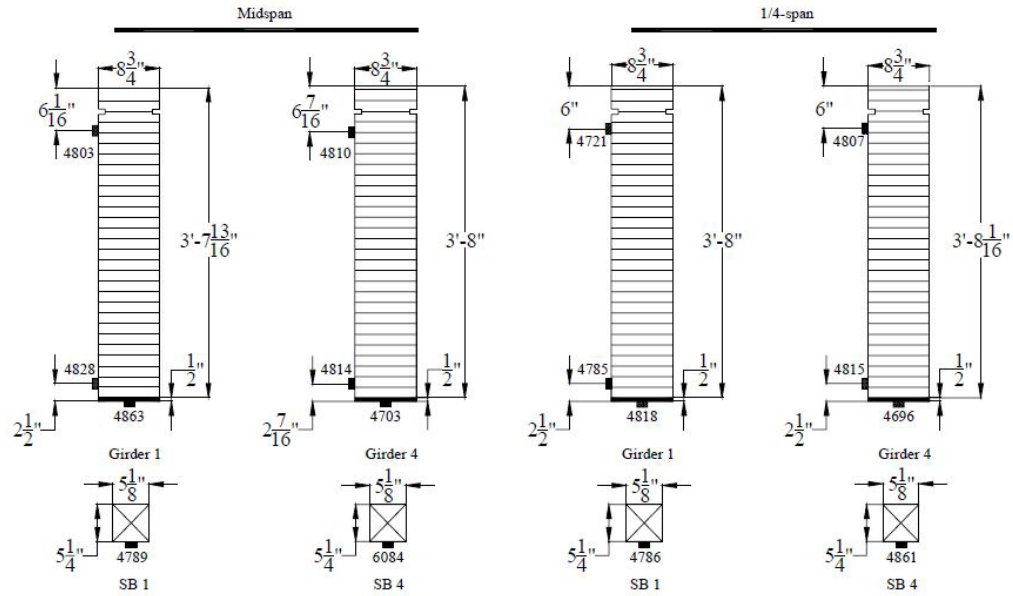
Position of the transducers on the Delaware county bridge girders [36].
